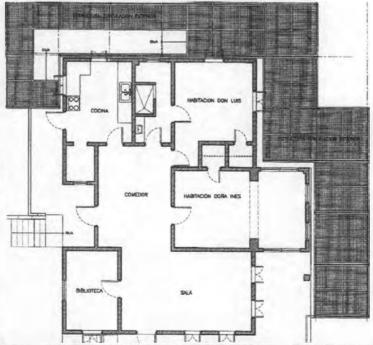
Interior distribution plan of the 1,170 square feet main house, Toro Ferrer Arquitectos CSP, 2005.
